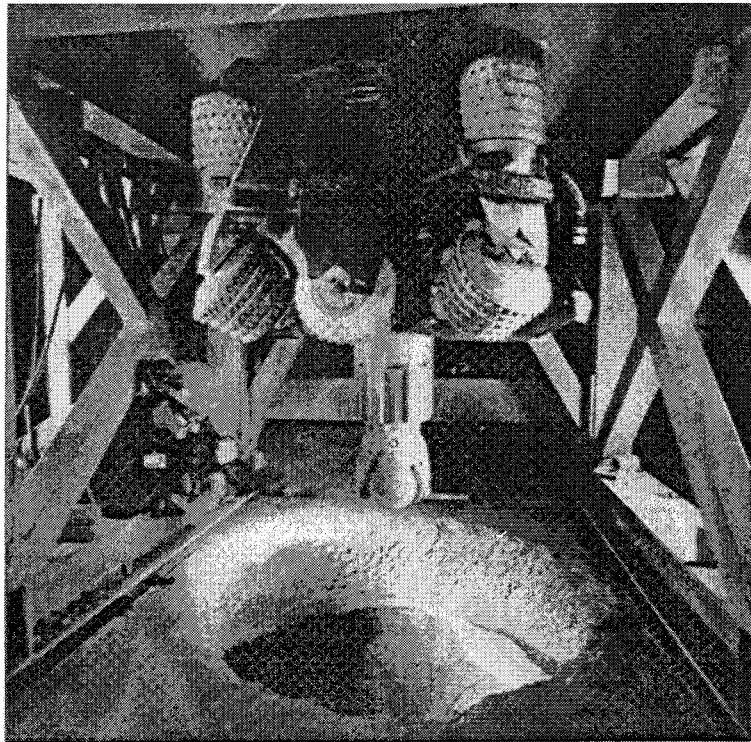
Subterranean-005L-137 raiseboring machine. The main components of the machine are: a) base frame, b) hydraulic cylinders, c) gear box, d) rotation motors, e) fastening sleeve for drill string. The device for changing drill pipes and locking is not shown.
